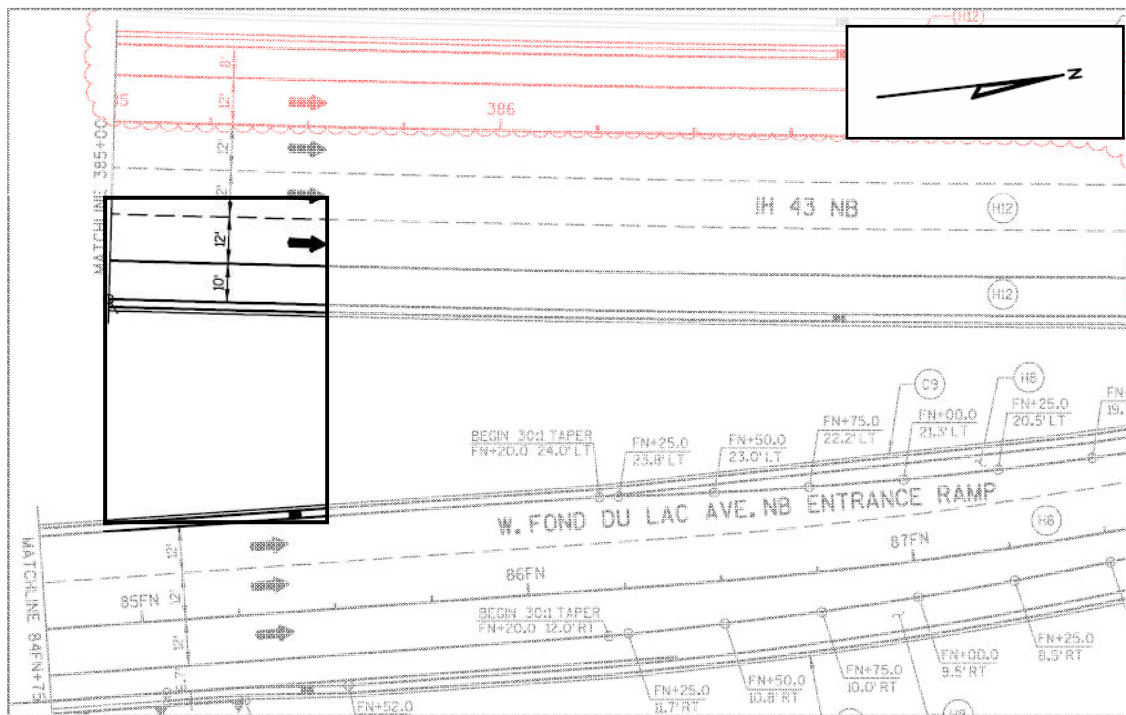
The highlighted area was the proposed location for instrumentation test section.
